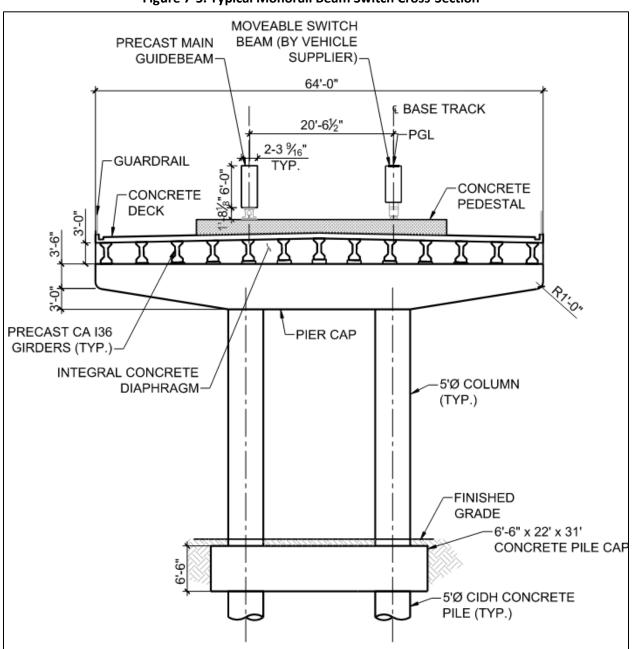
Typical Monorail Beam Switch Cross-Section
